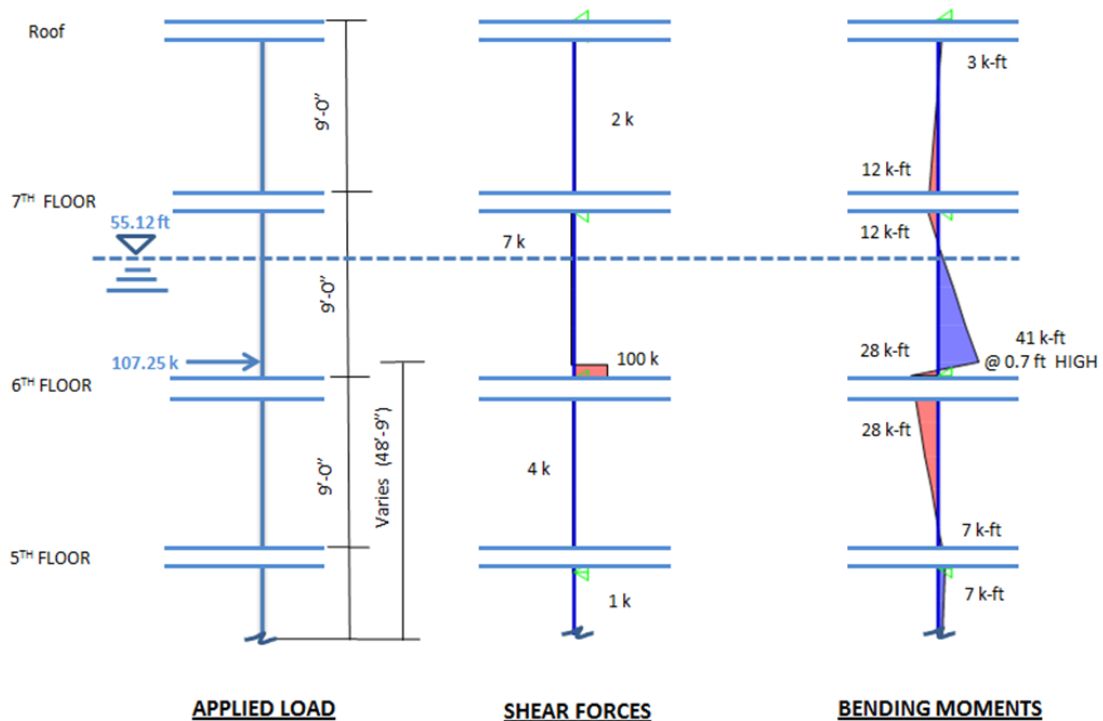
Impact load applied at d away from the end of column on the 6th floor
